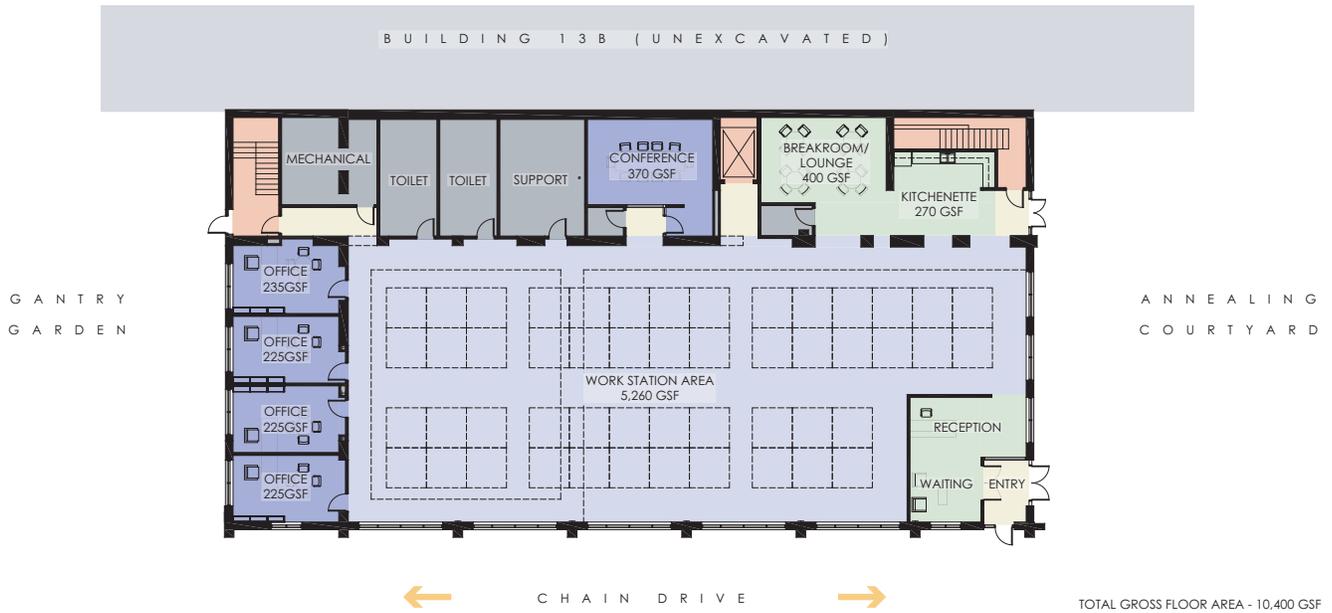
Building 10 - Potential Office Floor Plan (CJS)
